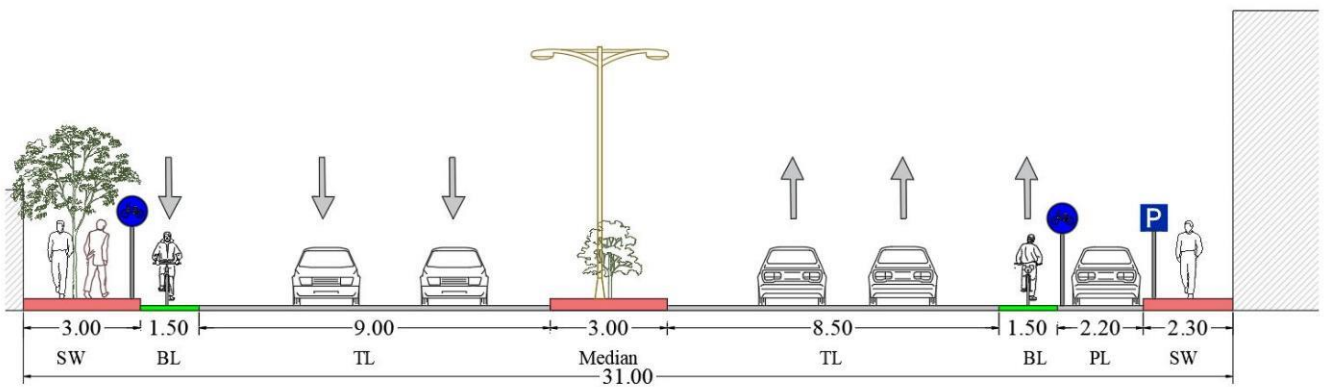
7: Typical Cross Section A-A, At An- Najah New Campus
